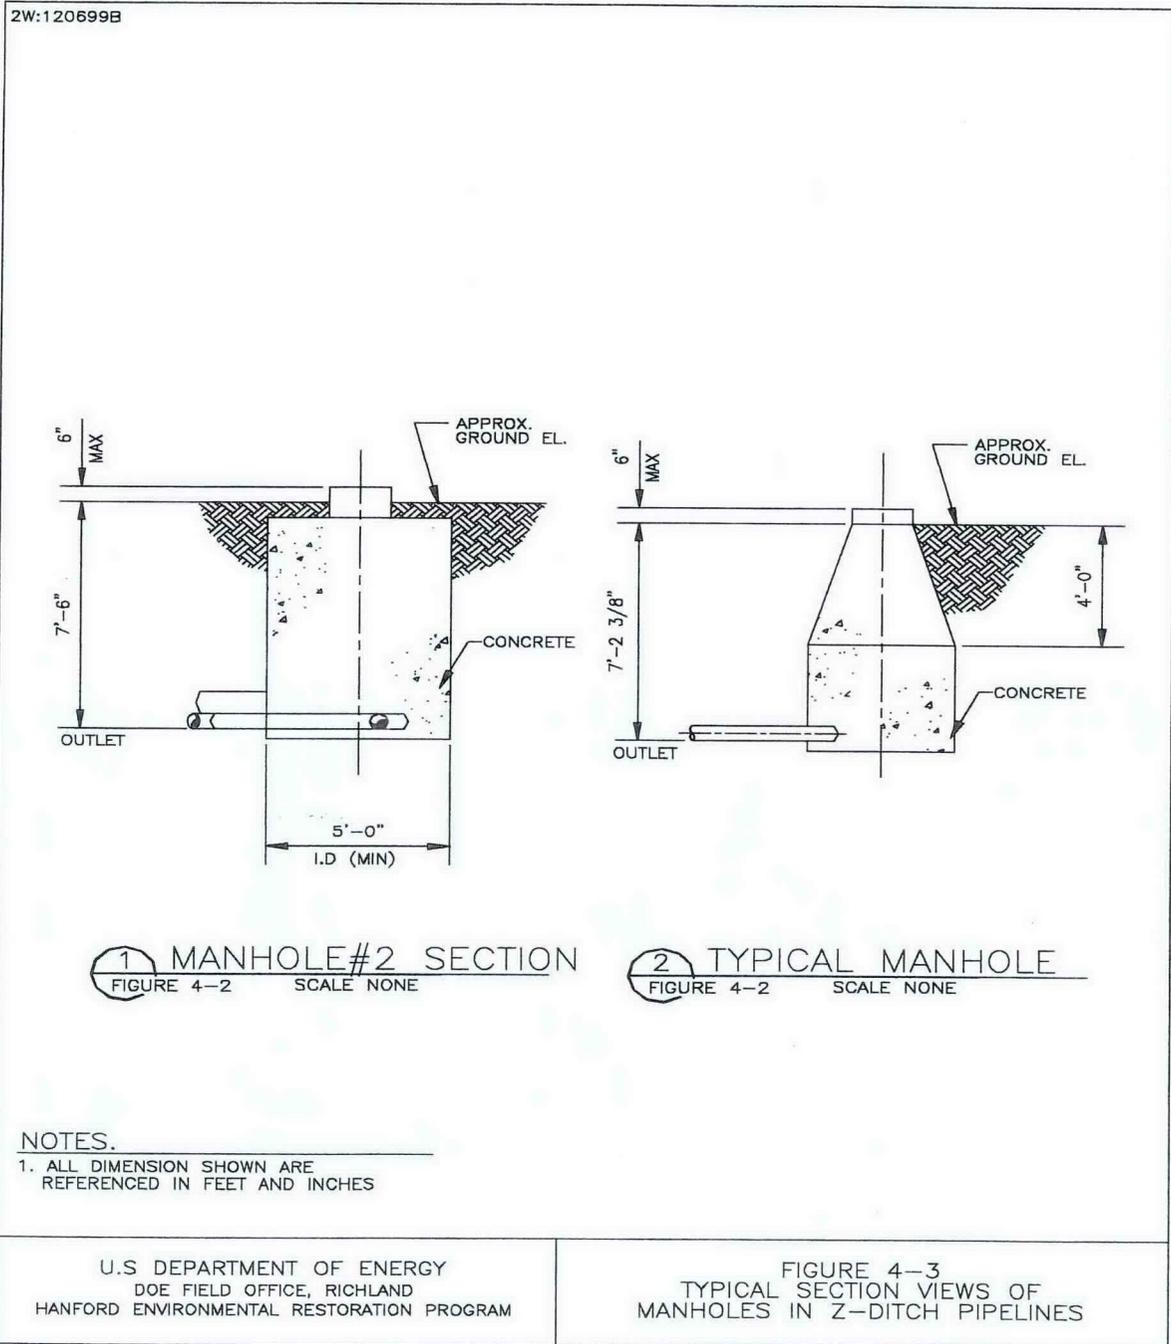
Typical Section Views of Manholes in Z-Ditch Pipelines.
